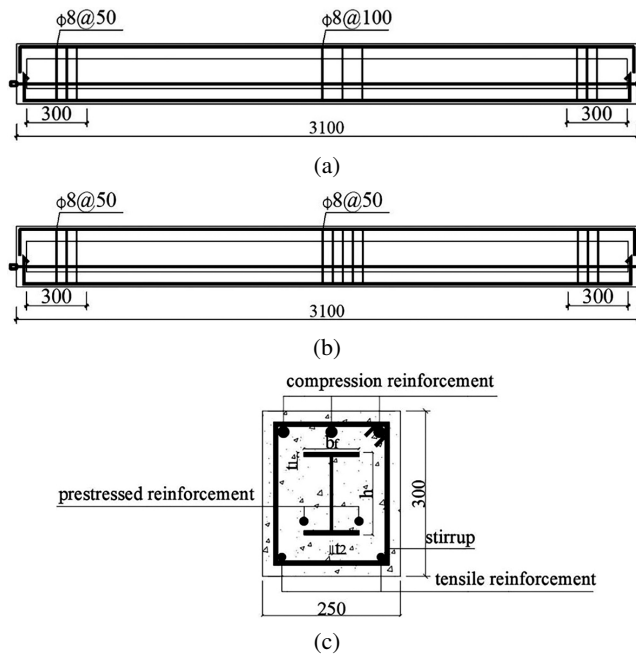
Geometry and construction of specimens: a) The shape and reinforcement of B-1 2 3 4 5 6 7 9, b) The shape and reinforcement of B-8, c) Cross-section of the specimens (mm)
